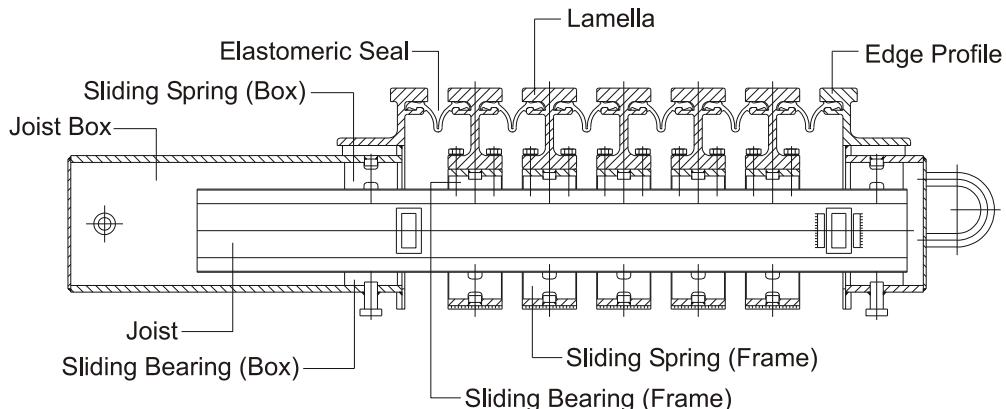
A Tensa® Modular expansion joint – Section at a support bar
